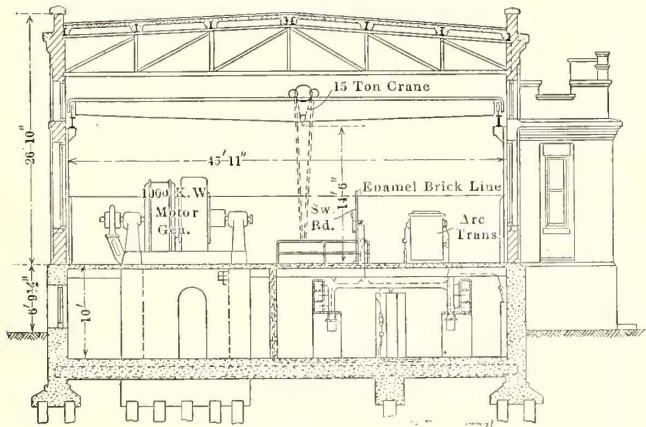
Detroit Tunnel—Cross-Section of Substation Along Line E-E Shown on Plan
